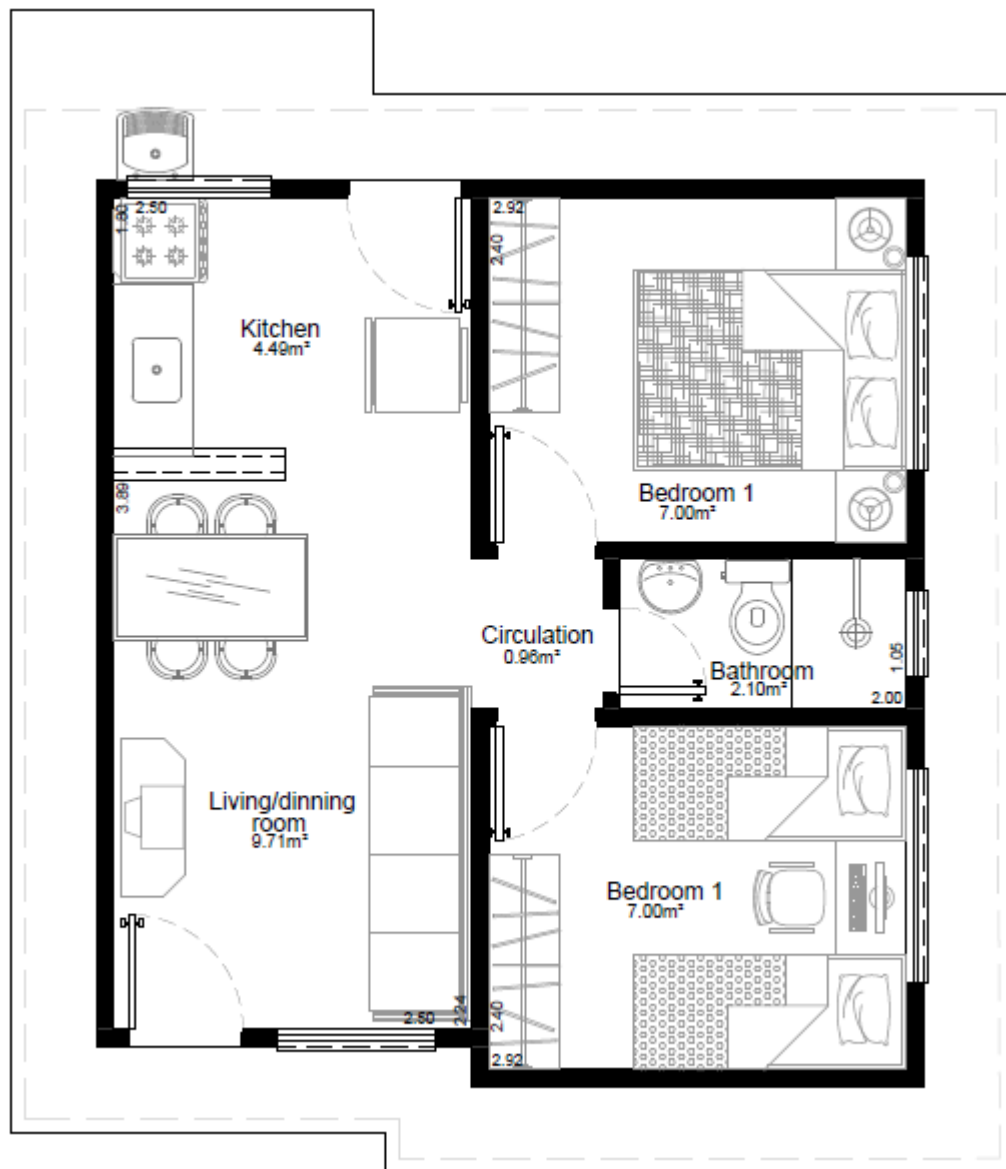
Floor plan of a standard house of Jose Maksoud.
